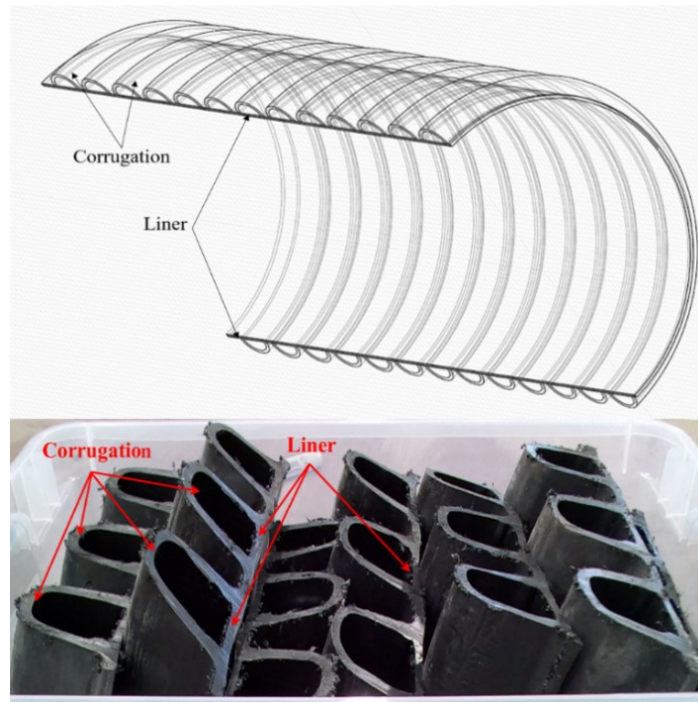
A sectional view of an HDPE pipe showing the location of the corrugation and liner.
